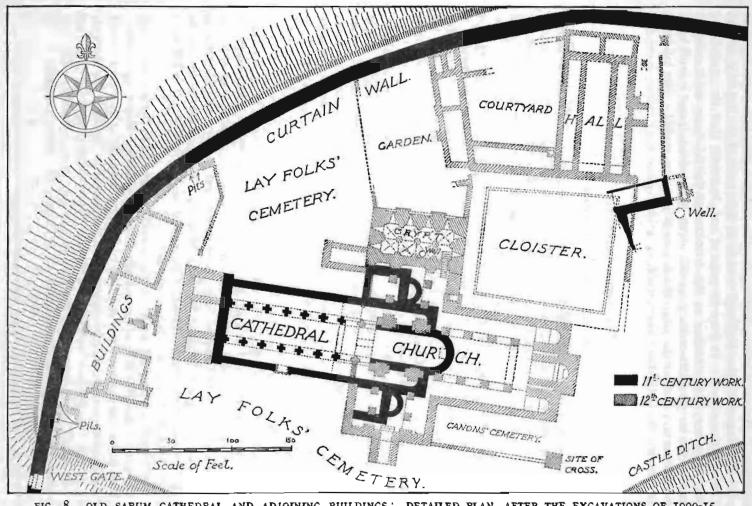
OLD SARUM CATHEDRAL AND ADJOINING BUILDINGS: DETAILED PLAN, AFTER THE EXCAVATIONS OF 1909-15 By D. H. Montgomerie: revised 1947
